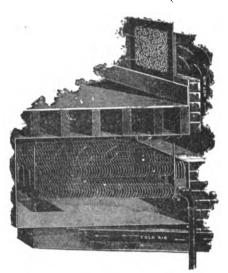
Steam Heater Connected to Wall Register.—Indirect System.
